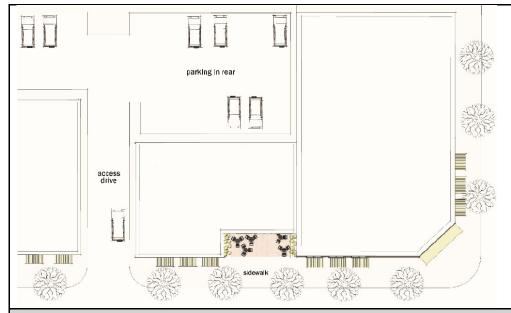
ENTRANCE AT BUILDING CORNER
